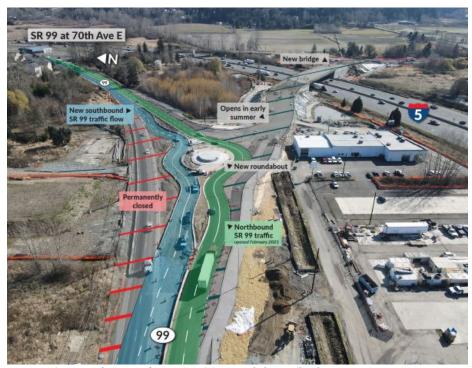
Aerial view of new SR-99 roundabout (looking east)
